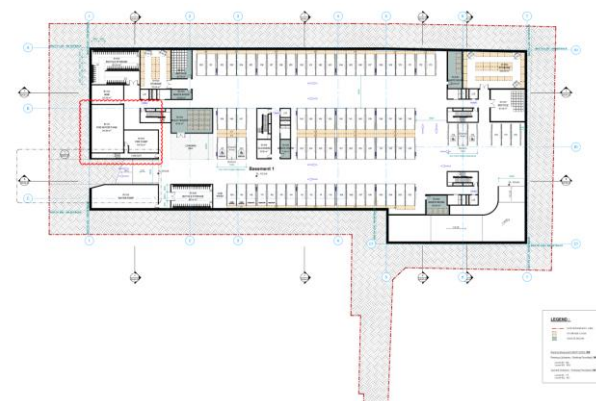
Revised Basement 1 (Source: PMDL Architects)
